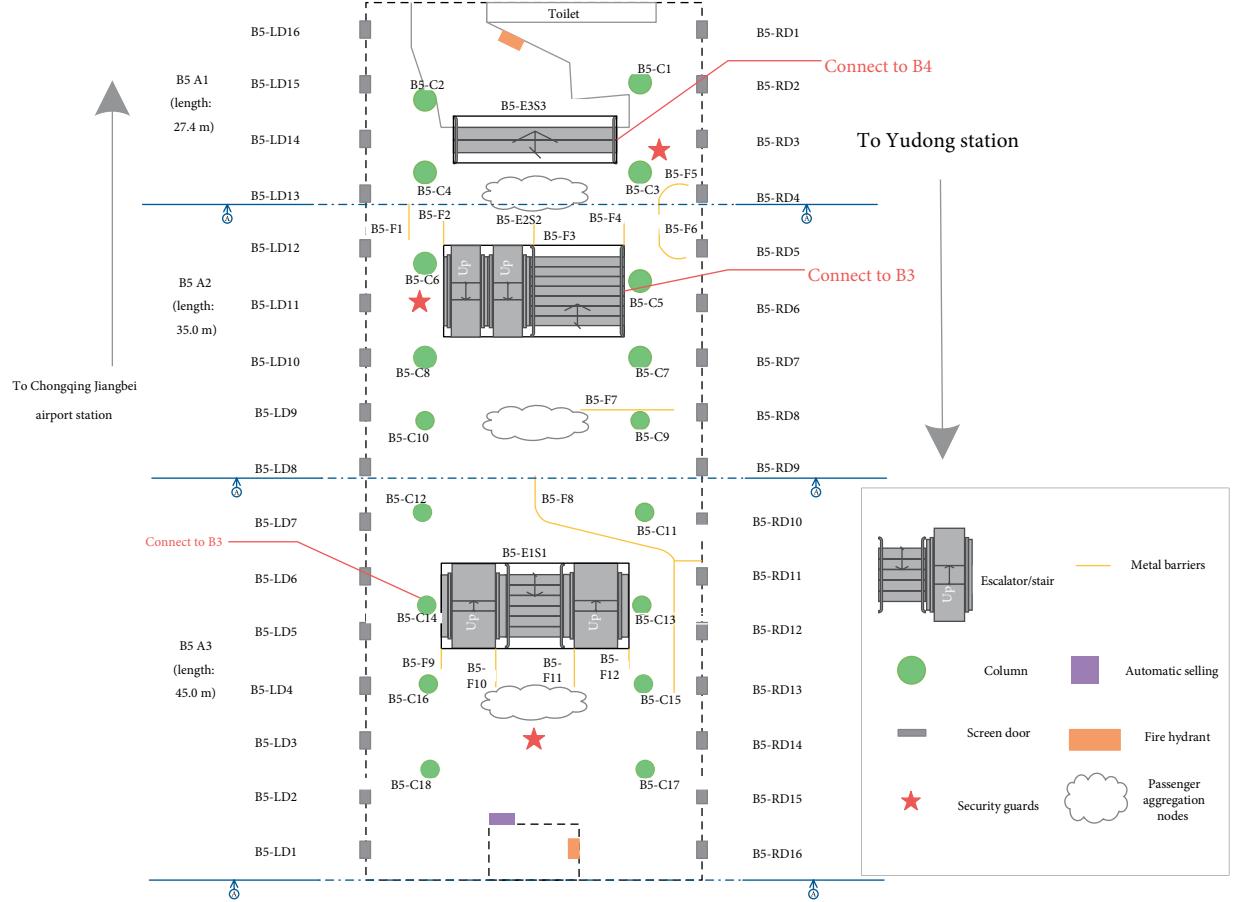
Layout of B5 floor (source: plotted by authors).
